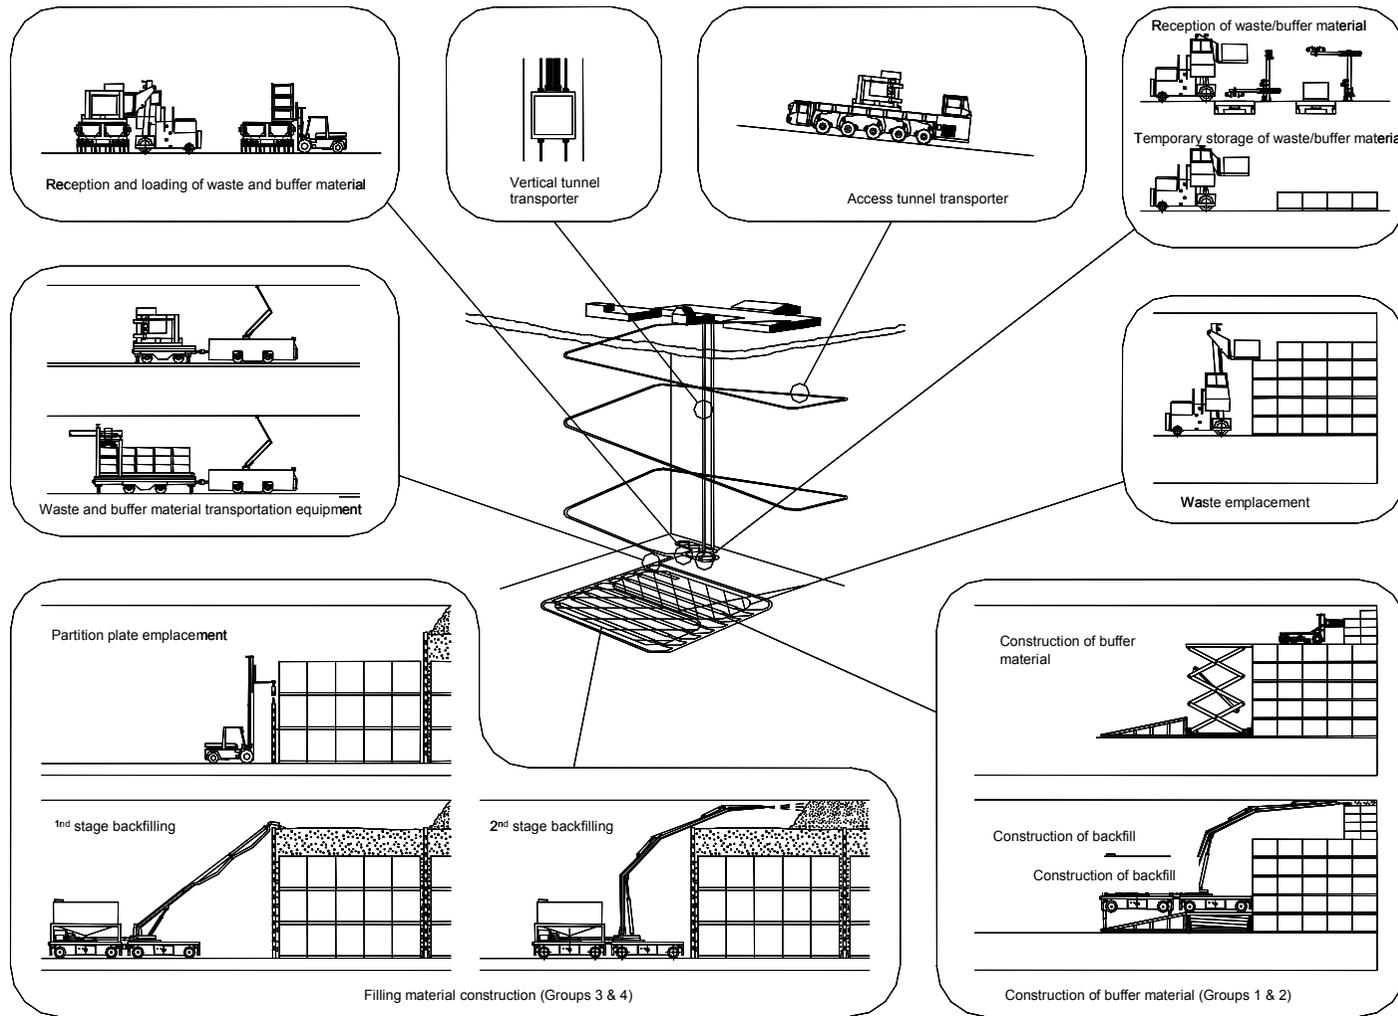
Overall view of handling equipment for underground facility (circular disposal tunnel)
